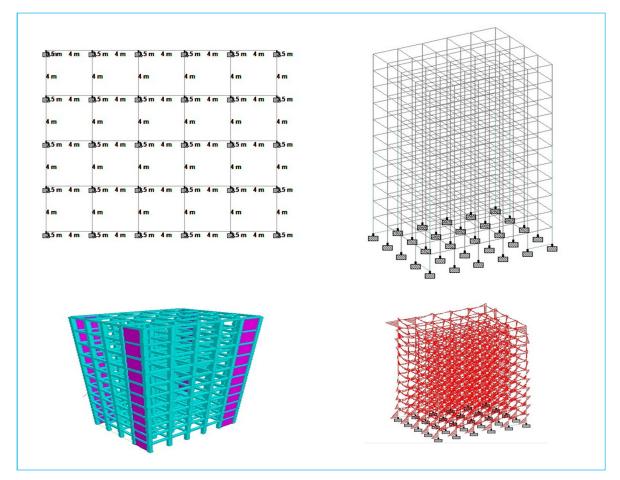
Staad Pro Plan, Elevation, 3D rendering View, Bending Moment Diagram
